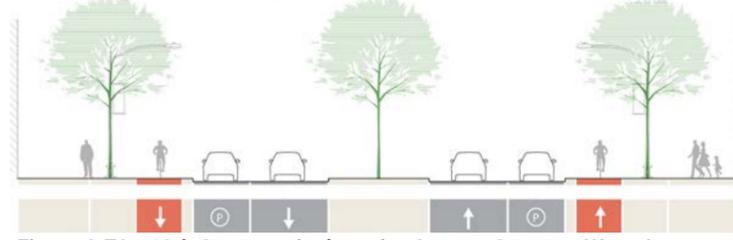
12th Street typical section Lavaca Street to West Avenue
